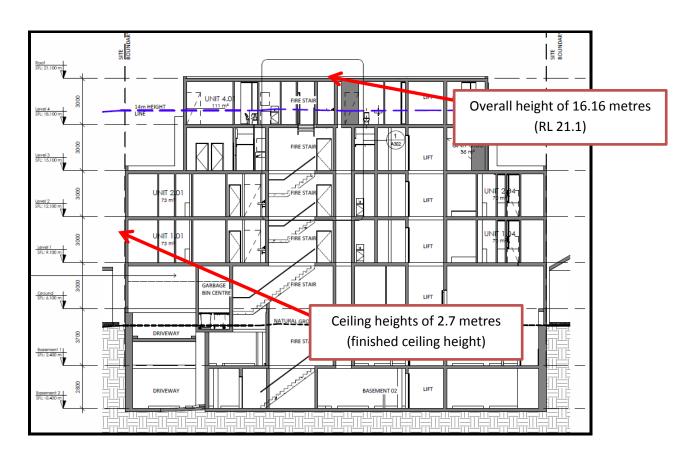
Approved Development adjoining to the west (Source: ACA, 24 August 2016)
